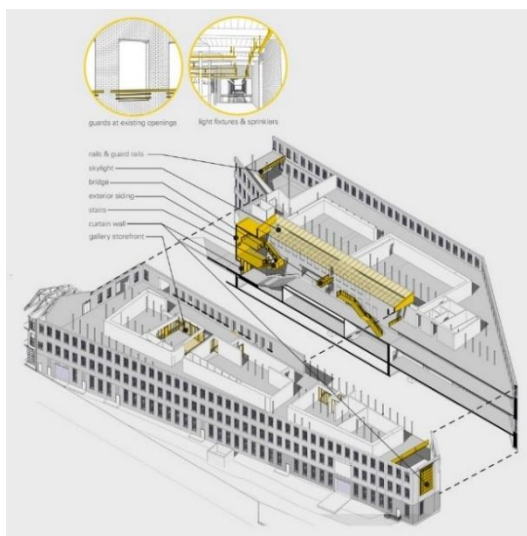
ELEMENTS WERE ADDED TO CREATE NEW FUNCTIONS FOR SPACES (ARCHDAILY, 2017)
